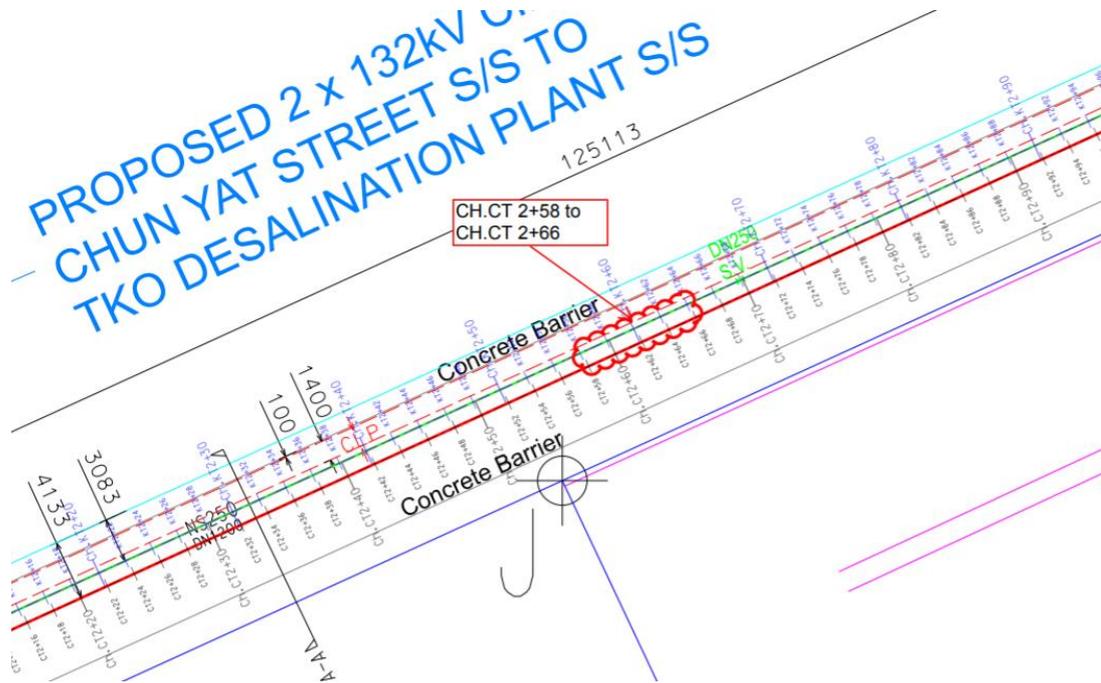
Location Plan for CH.CT 2+58 – 2+66
